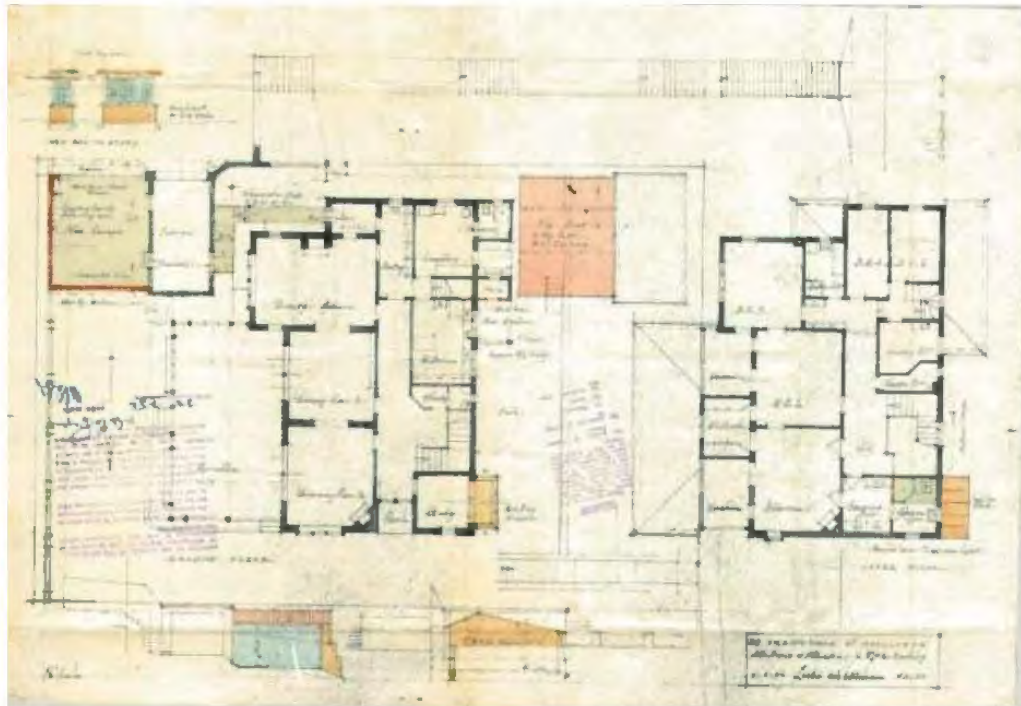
Plans from BA167/1956 for Dr J Dowling (Source: Woollahra Records)
